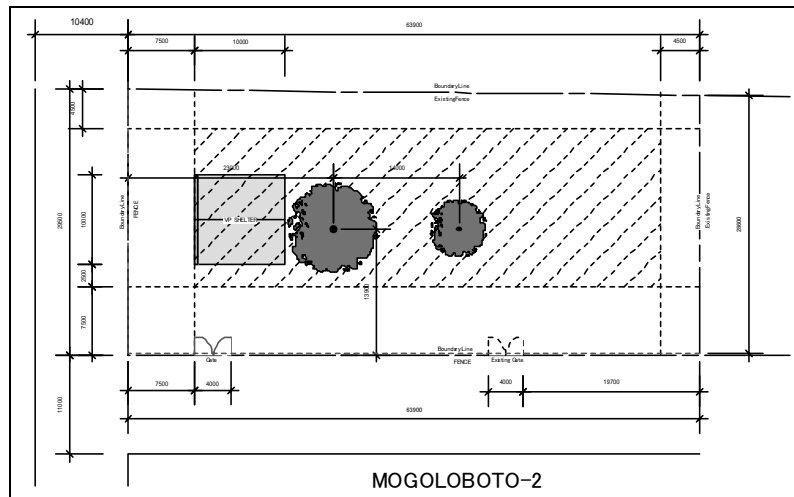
Approximate Site Plan of Mogoloboto-2
